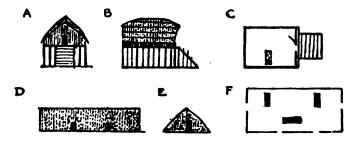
Elevations and ground plan of houses at Old Mawata. A-C, a house on piles; D-F, a ground hut, by A. W. Scale 32 ft. to 1 in.
